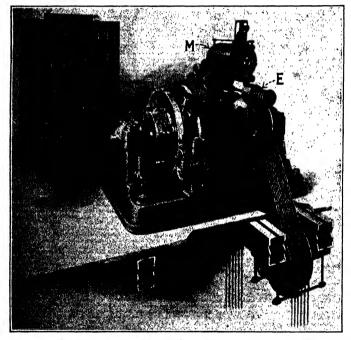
Gearless-traction machine with cables on traction and idler sheaves.
